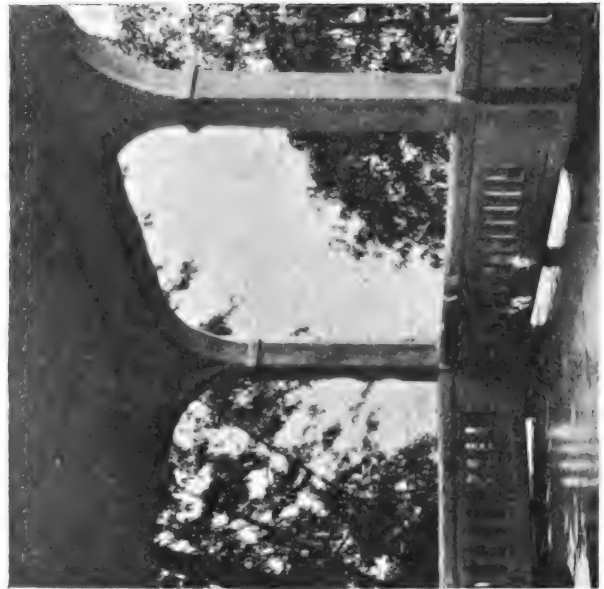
LARGE RESIDENCE OF DR. F. W. DUDLEY, NEAR MANILA, P. I.—WALLS, FLOORS, ROOF AND STAIRS OF CONCRETE
